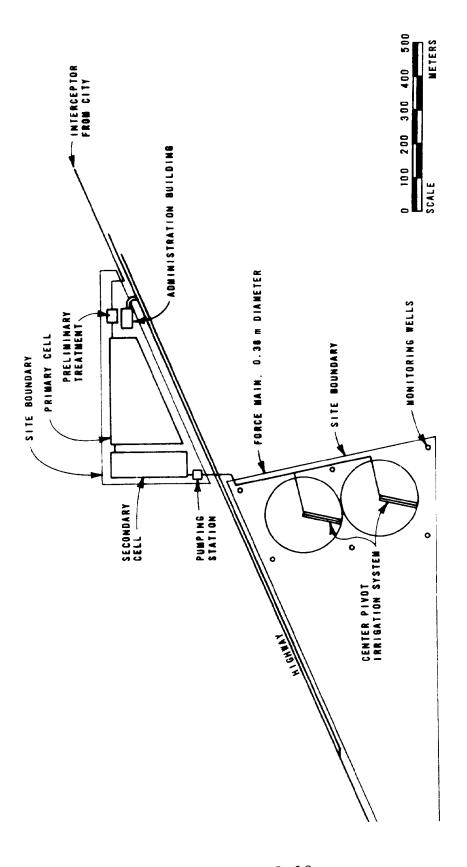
SYSTEM LAYOUT: FORAGE CROP ALTERNATIVE
